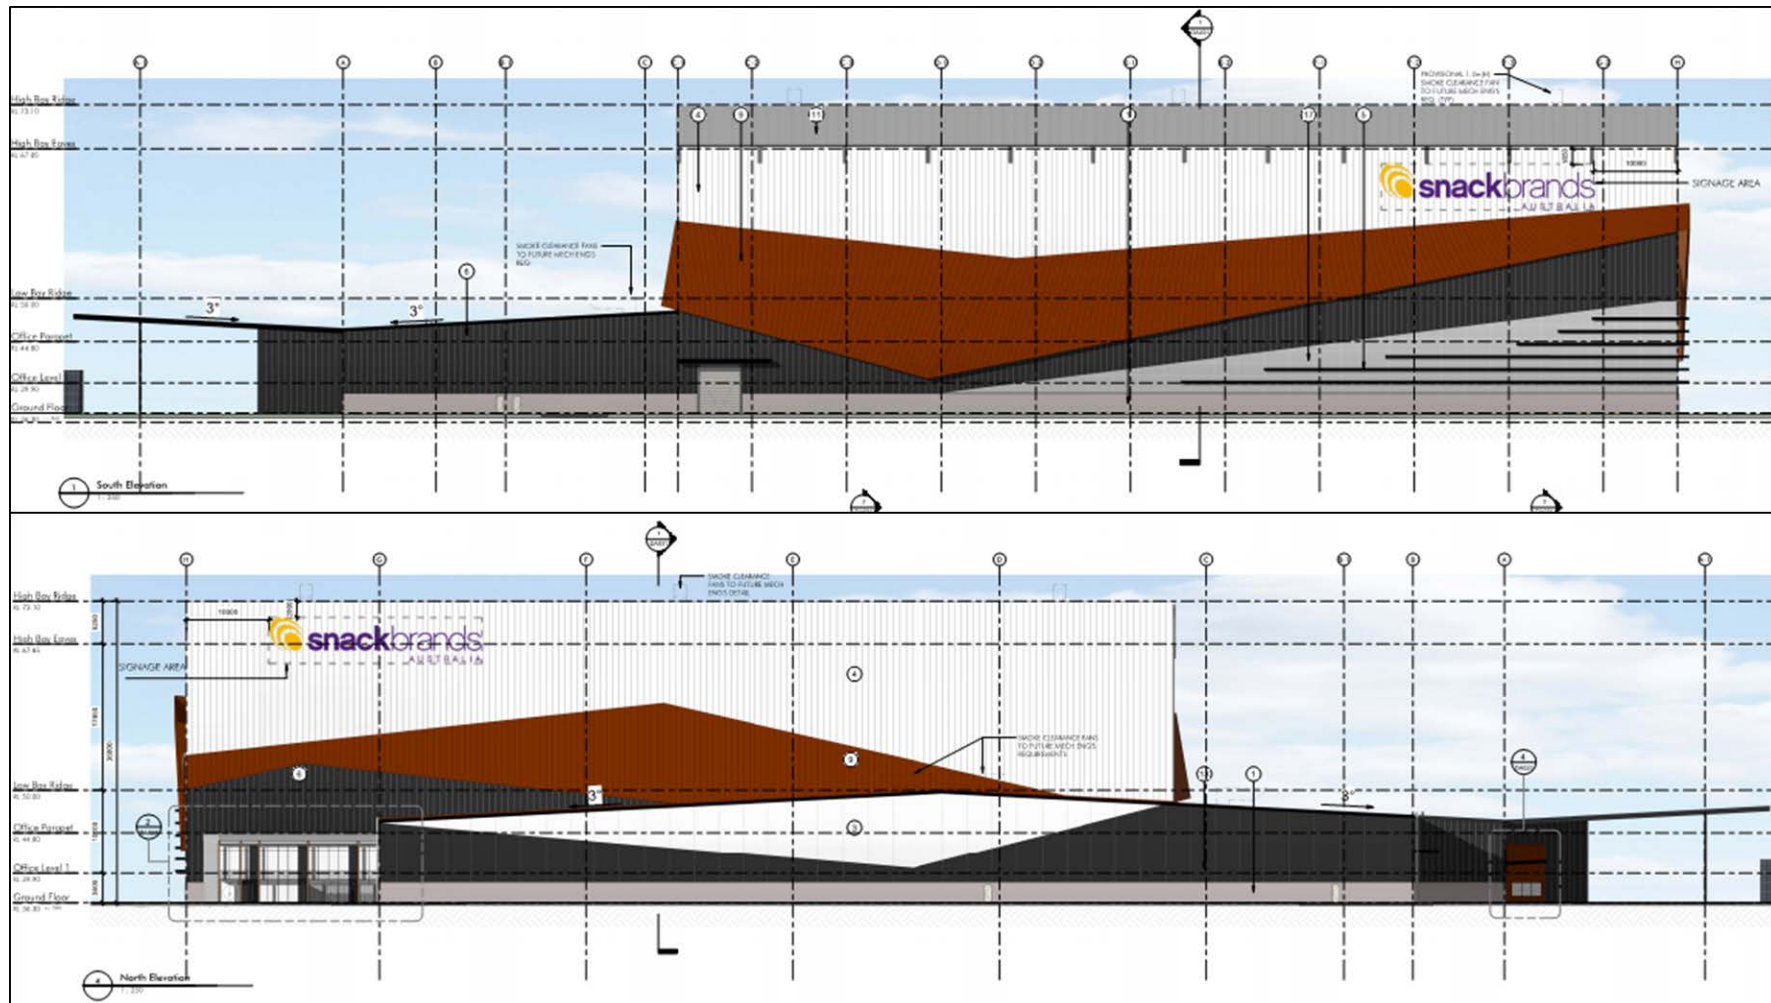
North Elevation (Bottom) & South Elevation (Top) of Subject Site (Nettleton Tribe, 2018)
